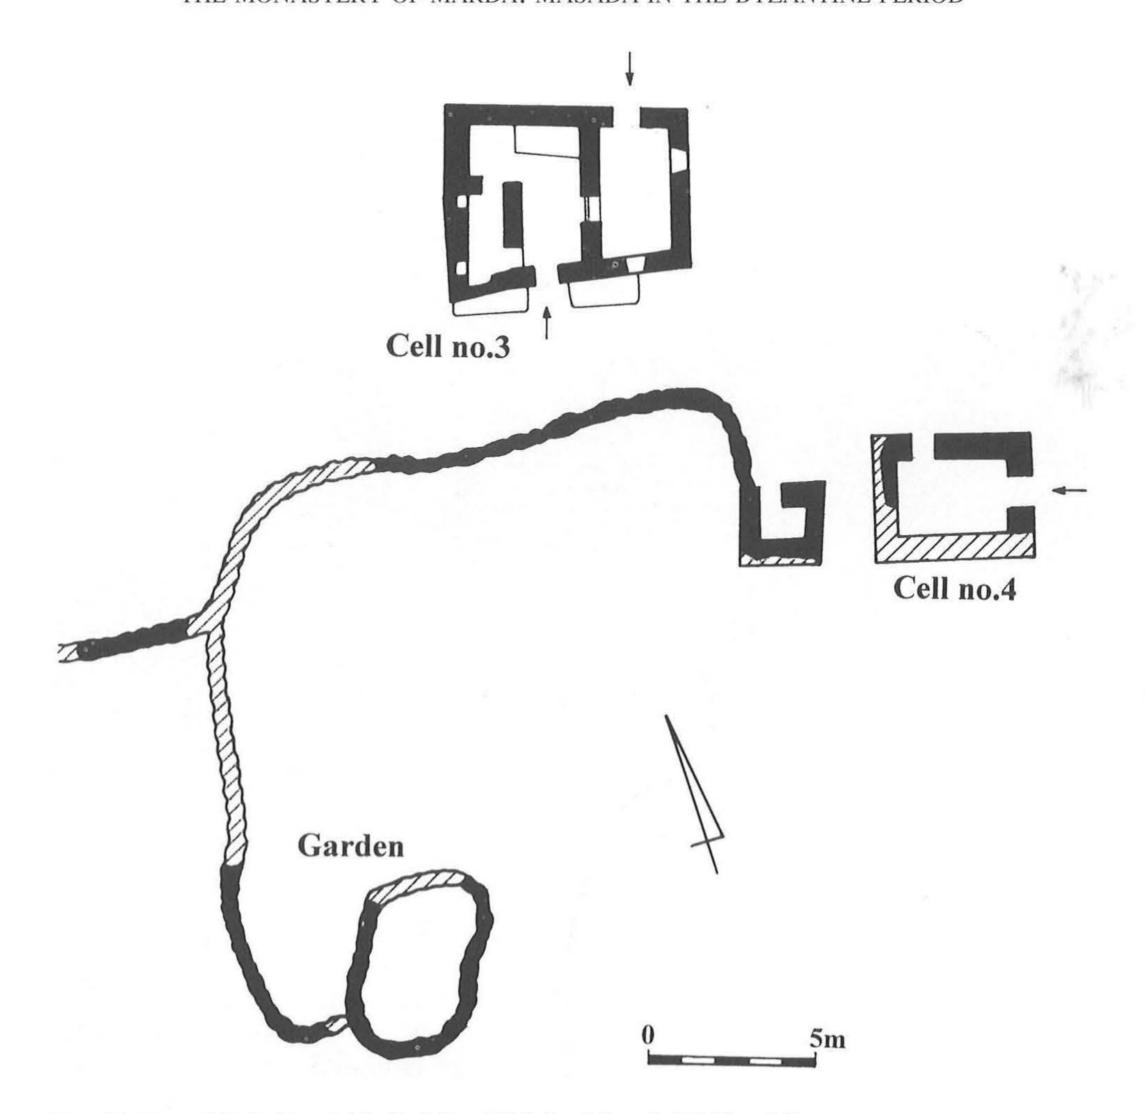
Plan of Cells 3 and 4 in Building IX (after Masada III, Plan 16).
